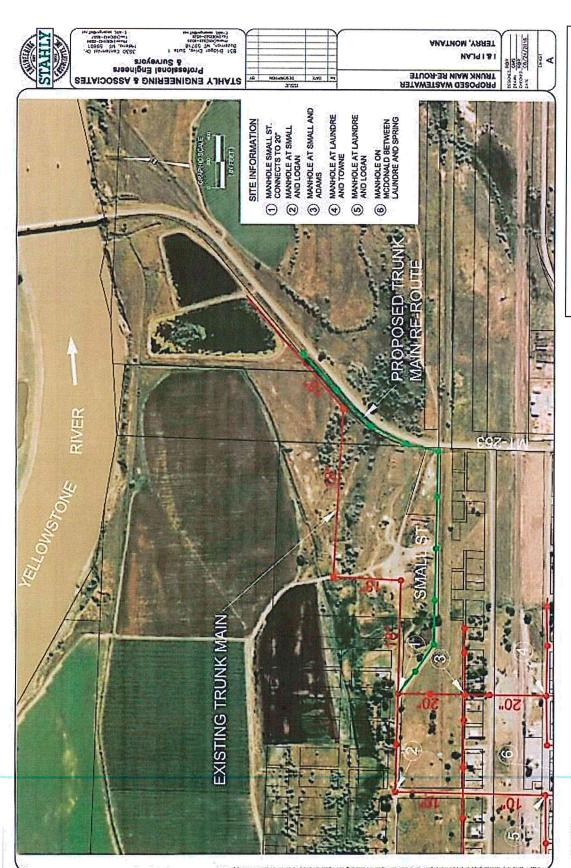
PROPOSED TRUNK SEWER MAIN OUTFALL ALIGNMENT
